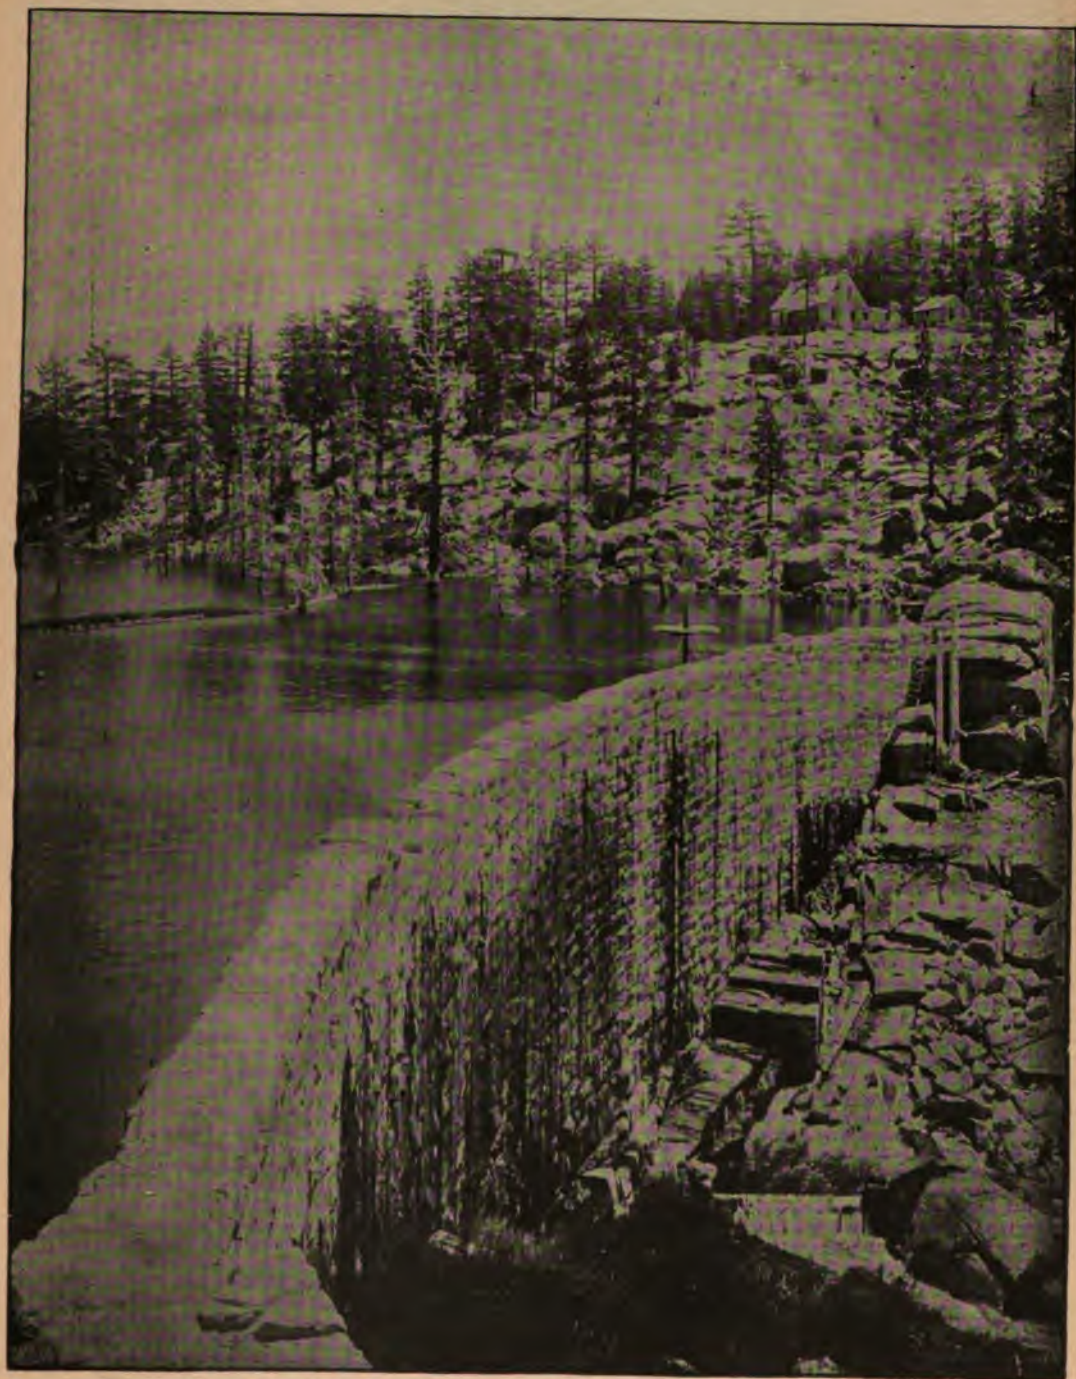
BEAR VALLEY DAM, LOOKING SOUTH, TOWARD SPILLWAY
